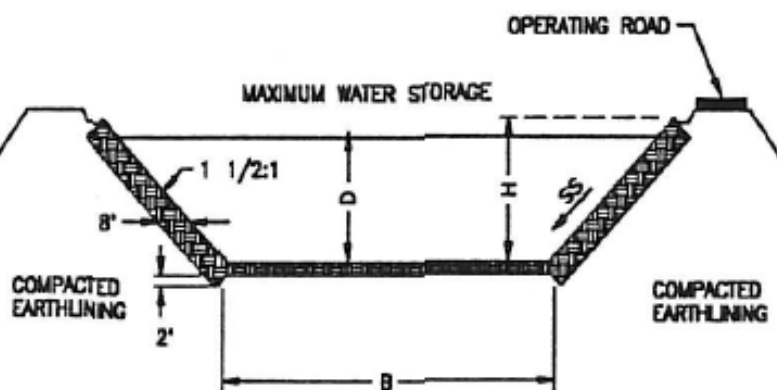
Typical Section, Compacted Earth-lined Canal Segments
